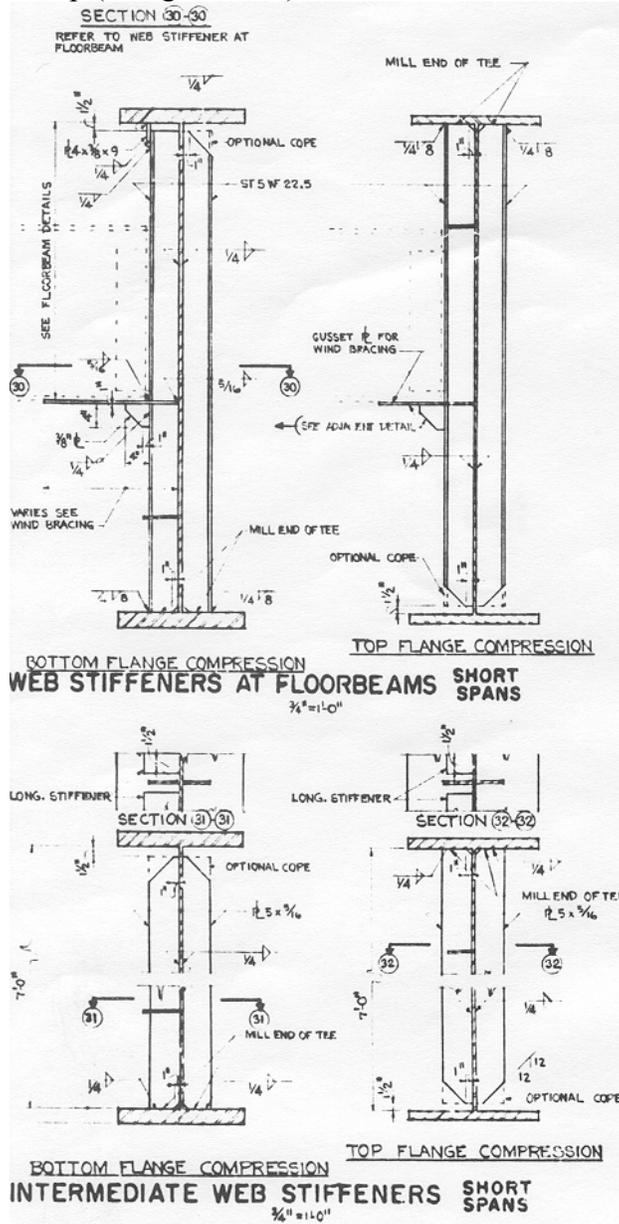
Transverse stiffener web gap (Bridge # 9330)
